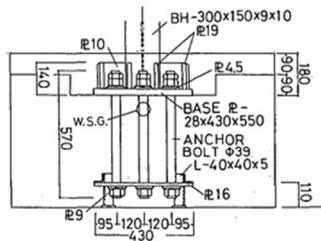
(c) Detail of anchorage of A and B-Type specimens (unit mm)
